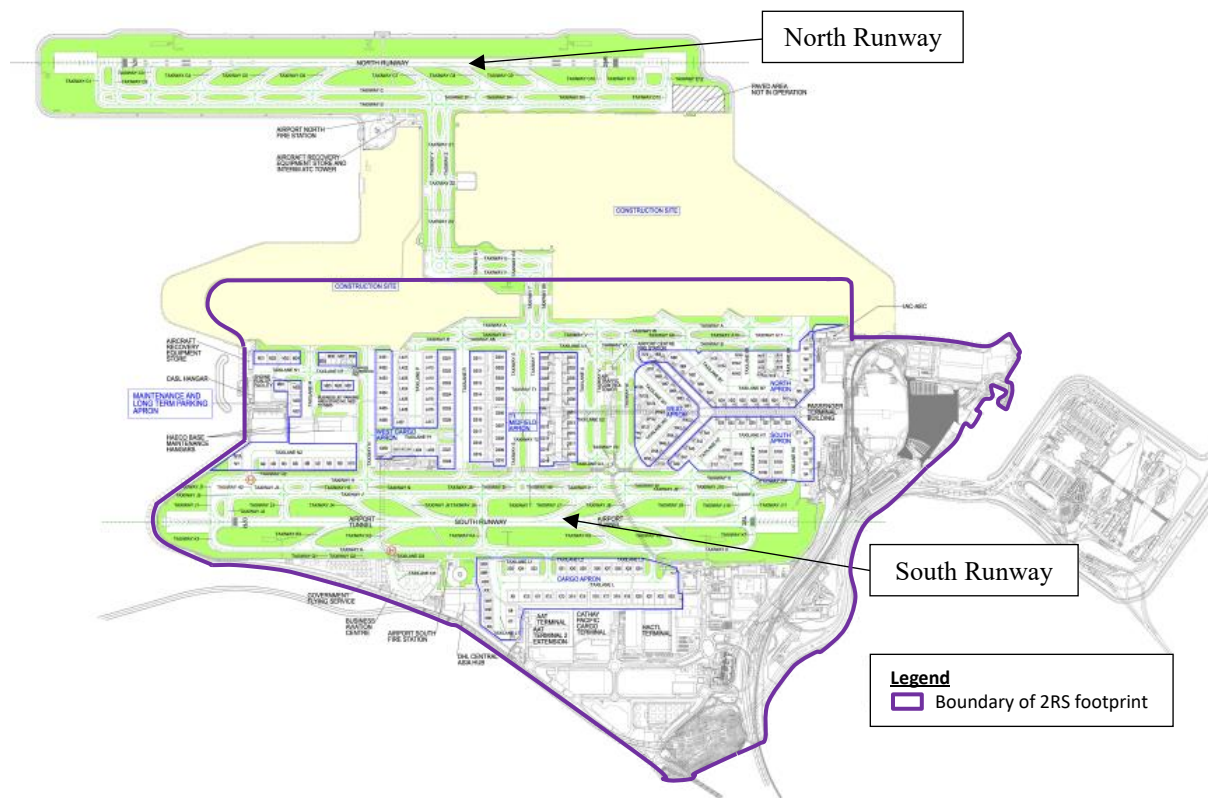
Aerodrome Layout Plan of the HKIA (I-2RS Stage)
